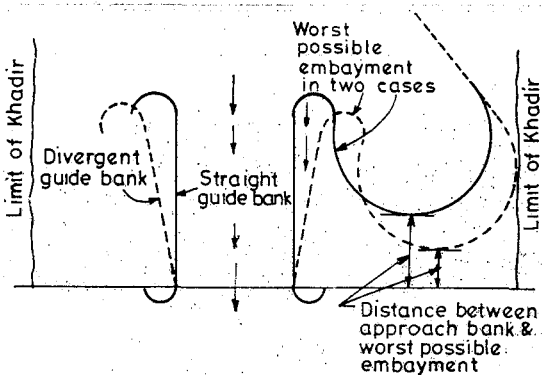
Extent of protection provided by the straight and divergent guide banks.
